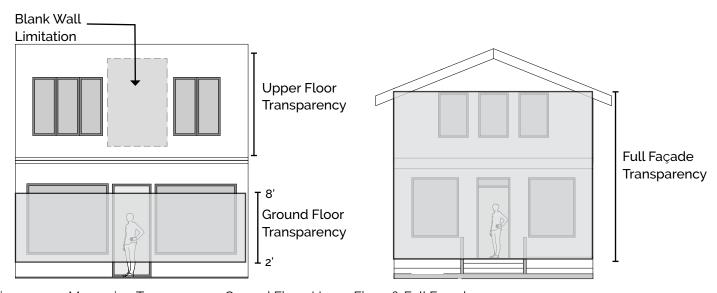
Measuring Transparency: Ground Floor, Upper Floor, & Full Facade
